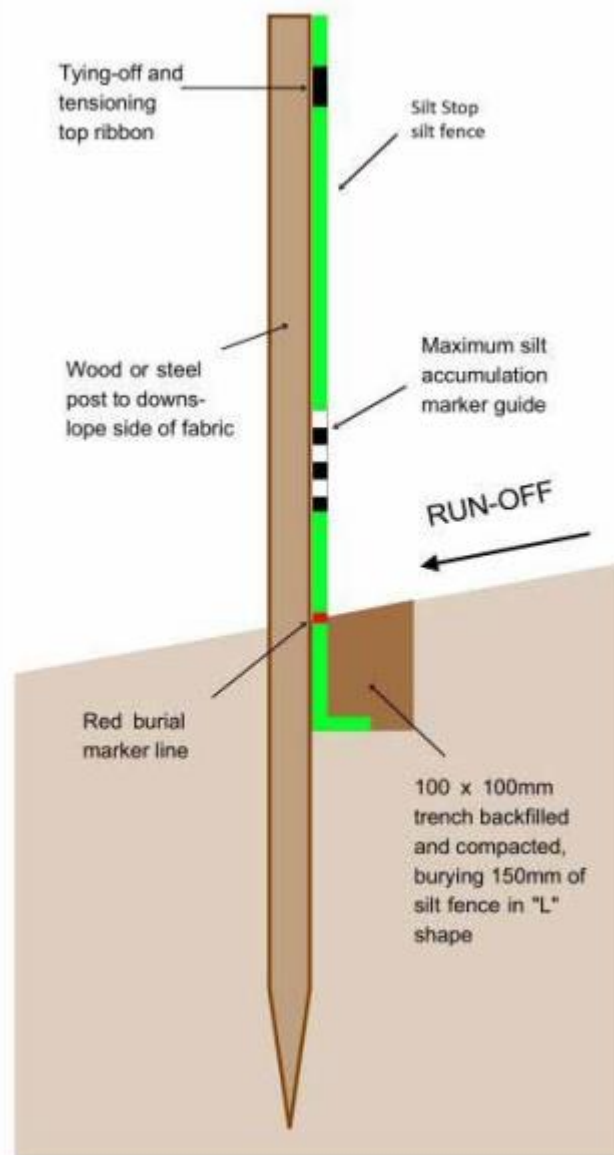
Silt Fence Cross Section [Source Hy-Tex Terrastop Silt Fence Construction Methods]
